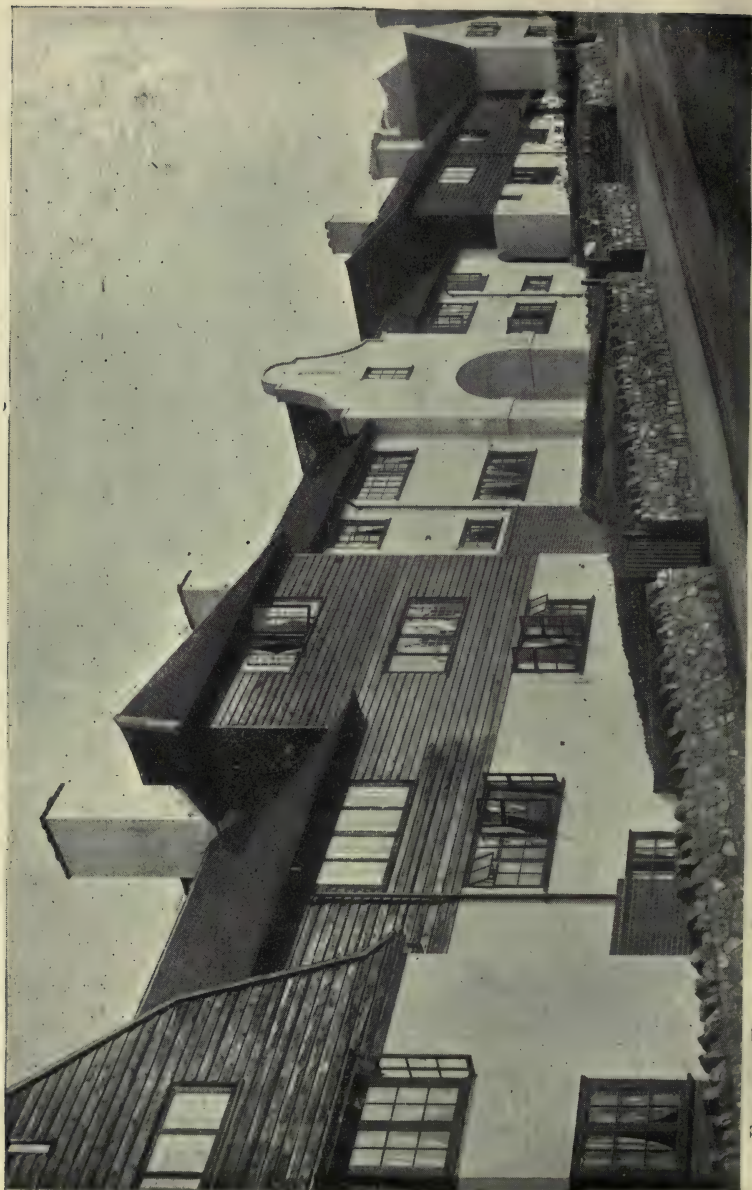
Treatment of steep street in Housing Scheme at Folkestone. Ewart G. Culpin & R. S. Bowers, Architects.
